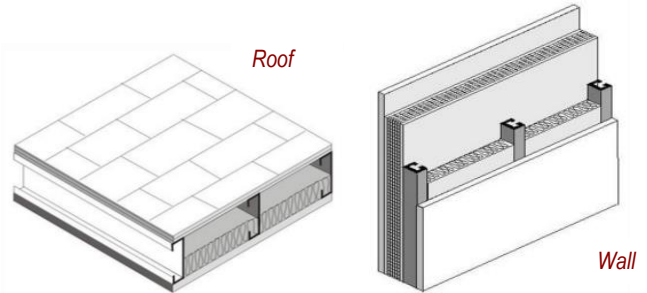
Example Roof & Wall Assemblies-per Joint Appendix 4
